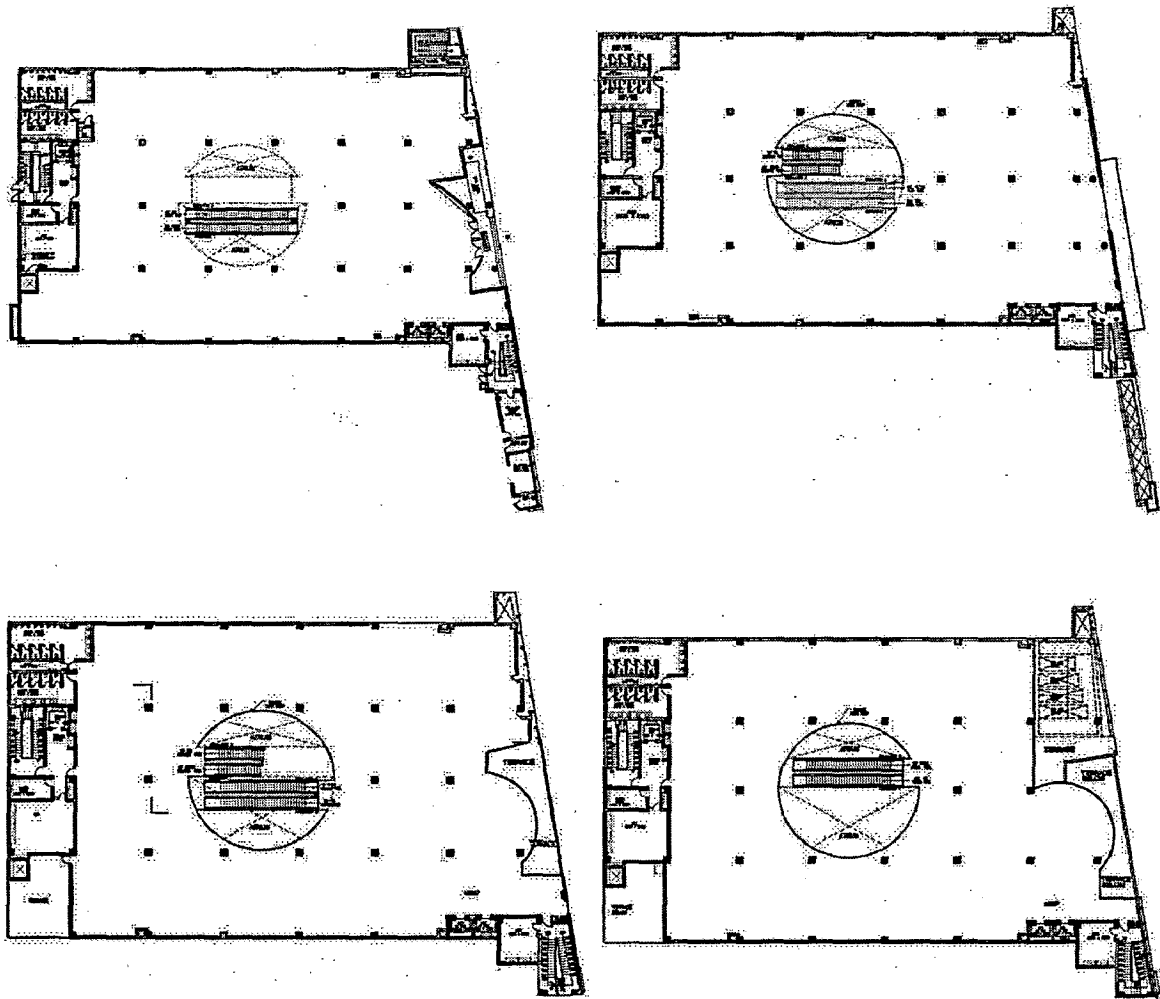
FLOOR PLANS OF GURGAON CENTRAL MALL.
